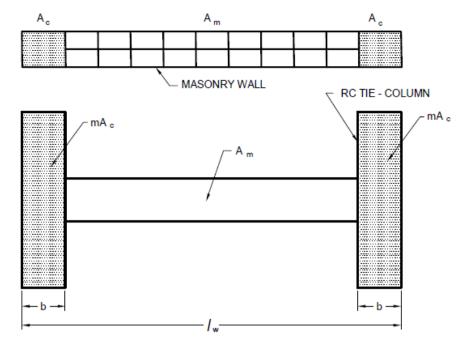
TRANSFORMED SECTION PROPERTIES OF A CONFINED MASONRY PANEL
